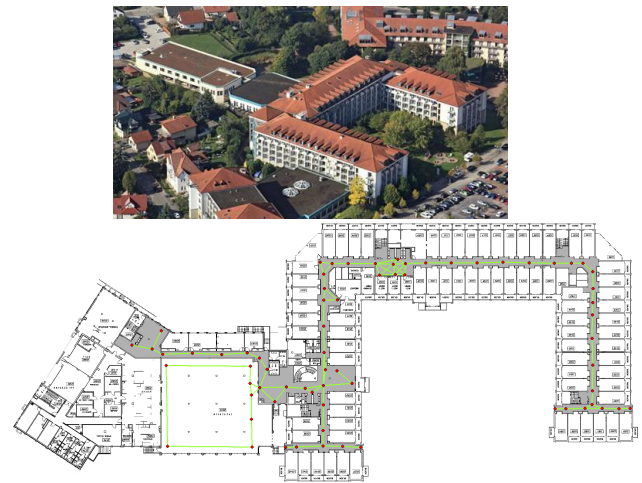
View and floor plan of one floor of the multi-level rehabilitation center in Bad Liebenstein (Germany) used as test site in the ROREAS project.
